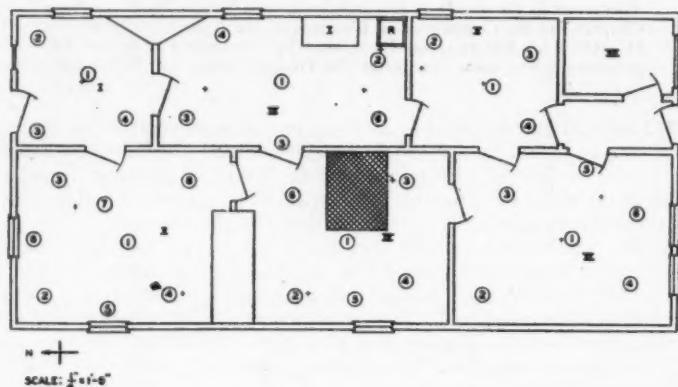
FLOOR PLAN, SHOWING LOCATION OF INSTRUMENTS
